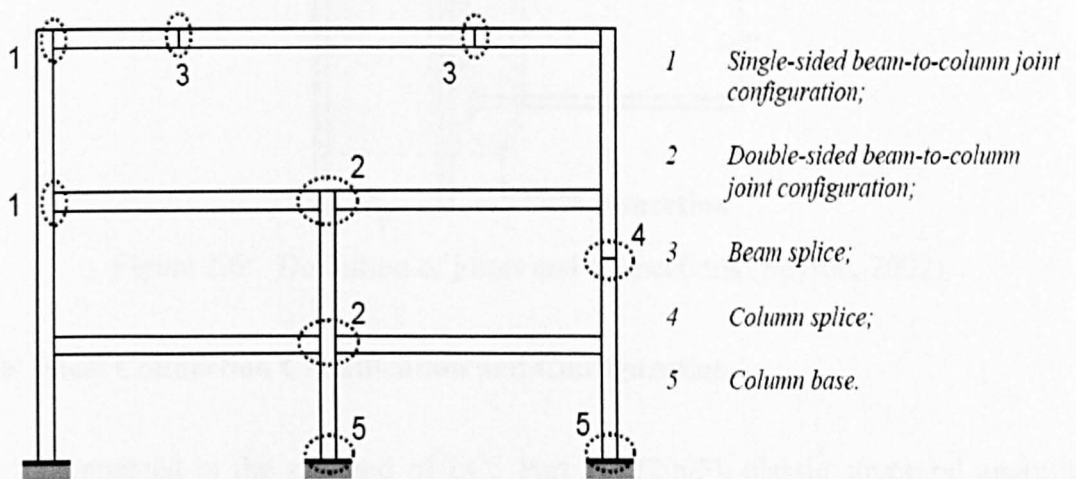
Different types of connections in a building frame (EC 3, 2005)
